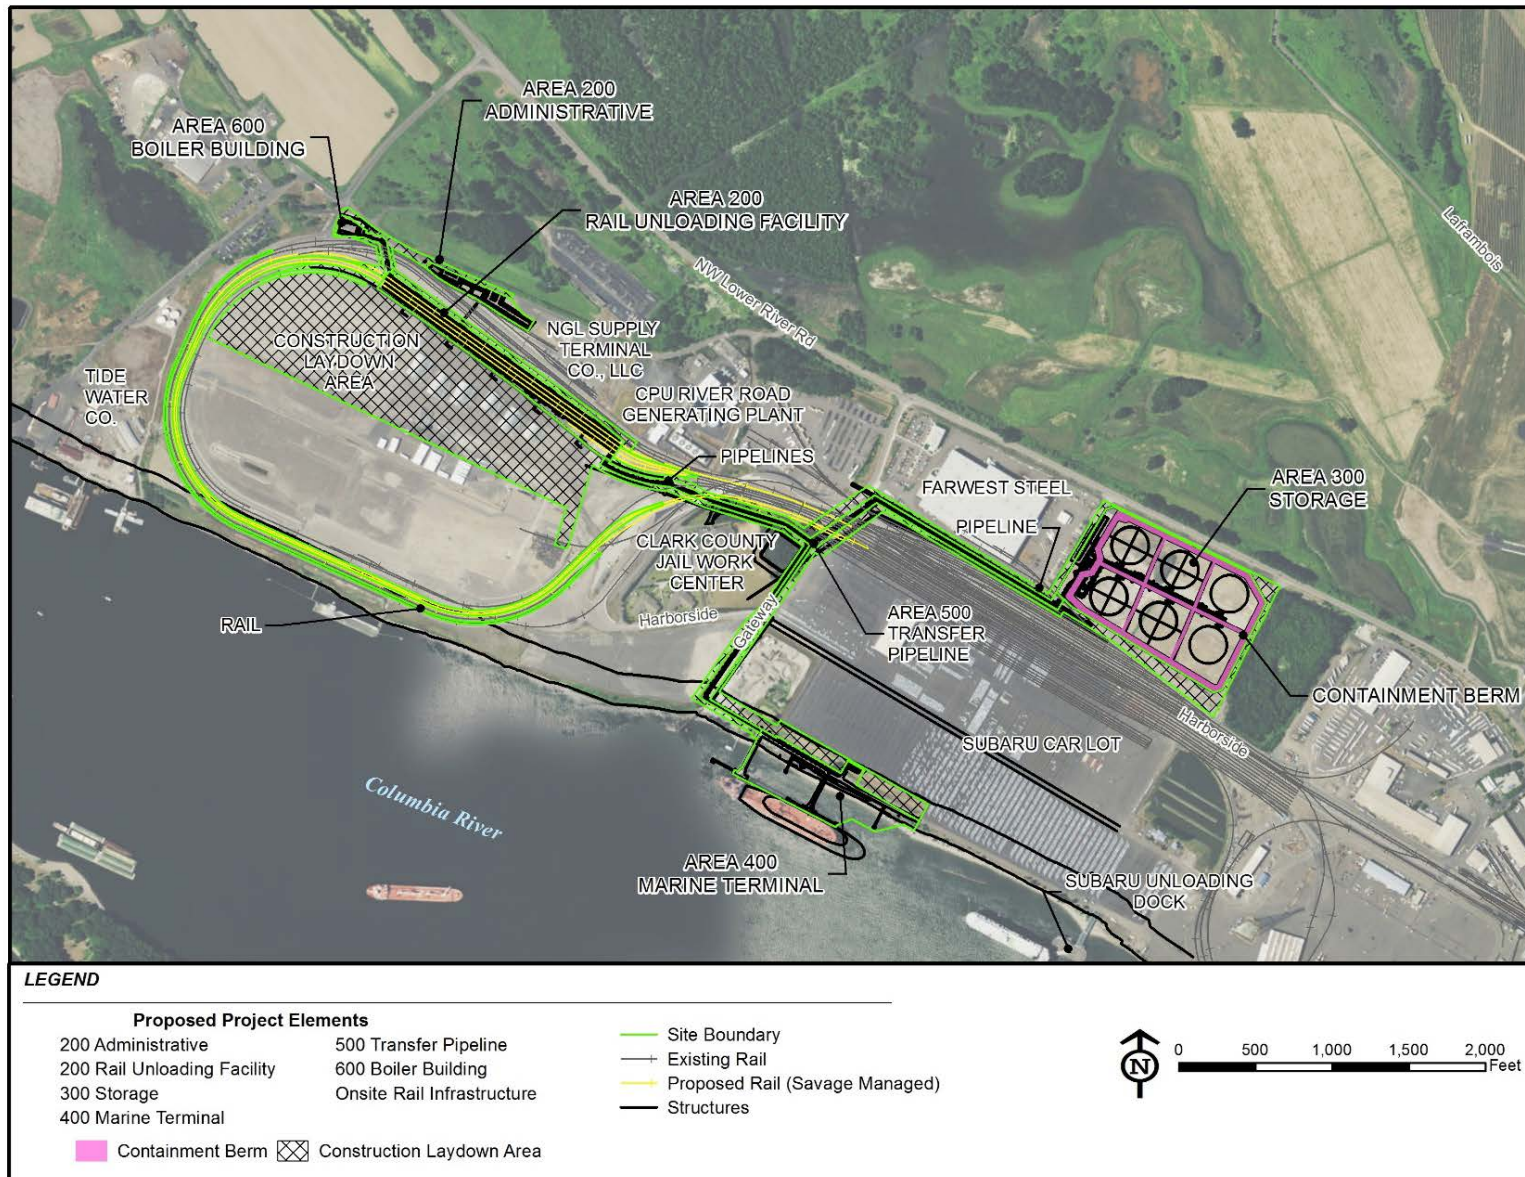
Proposed Facility Site Layout and Existing Adjacent Properties
